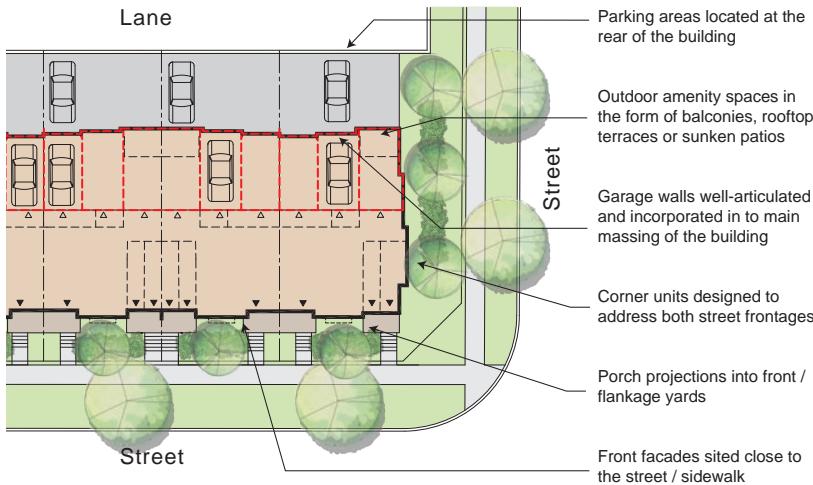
Conceptual plan layout for stacked townhouses with lane-accessed private garages
